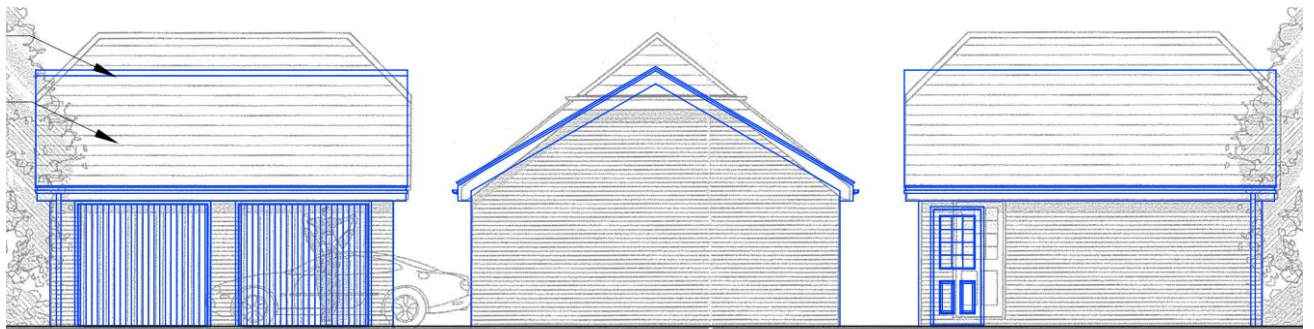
Proposed garage elevations (in blue) overlaid over extant permission
